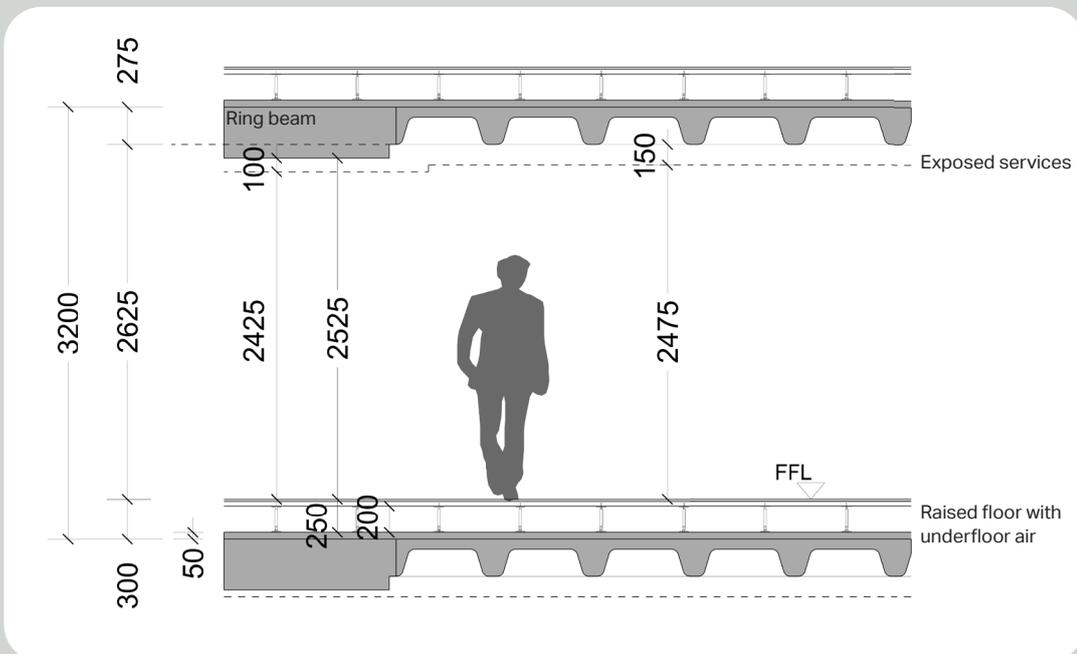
Existing floor to ceiling height (above) and selected modernisation options (overleaf)
